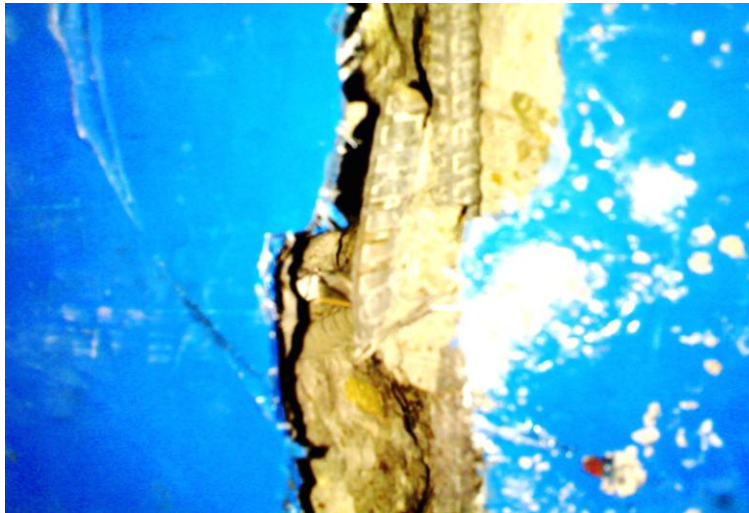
Fiber fracture in beam Retrofitted with Non Prestressed fiber sheet
